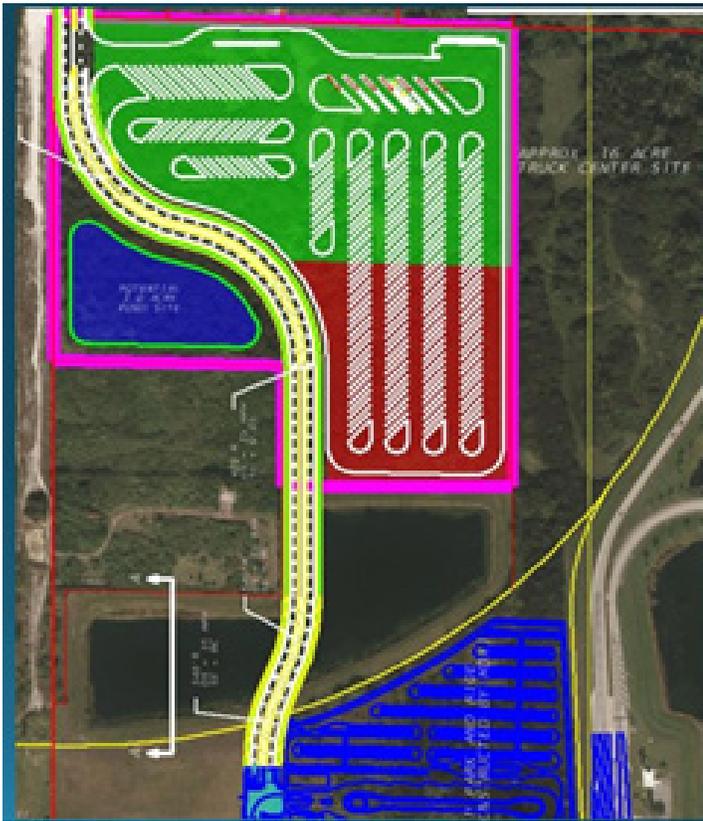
Revised NW 12th St. site, approx. 17 acres available for a travel center.
